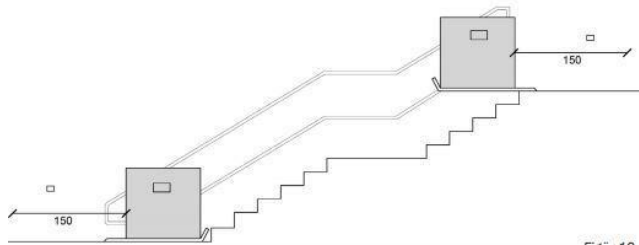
Lifting platform for stairs (Standards of Handicapped, 2015)
